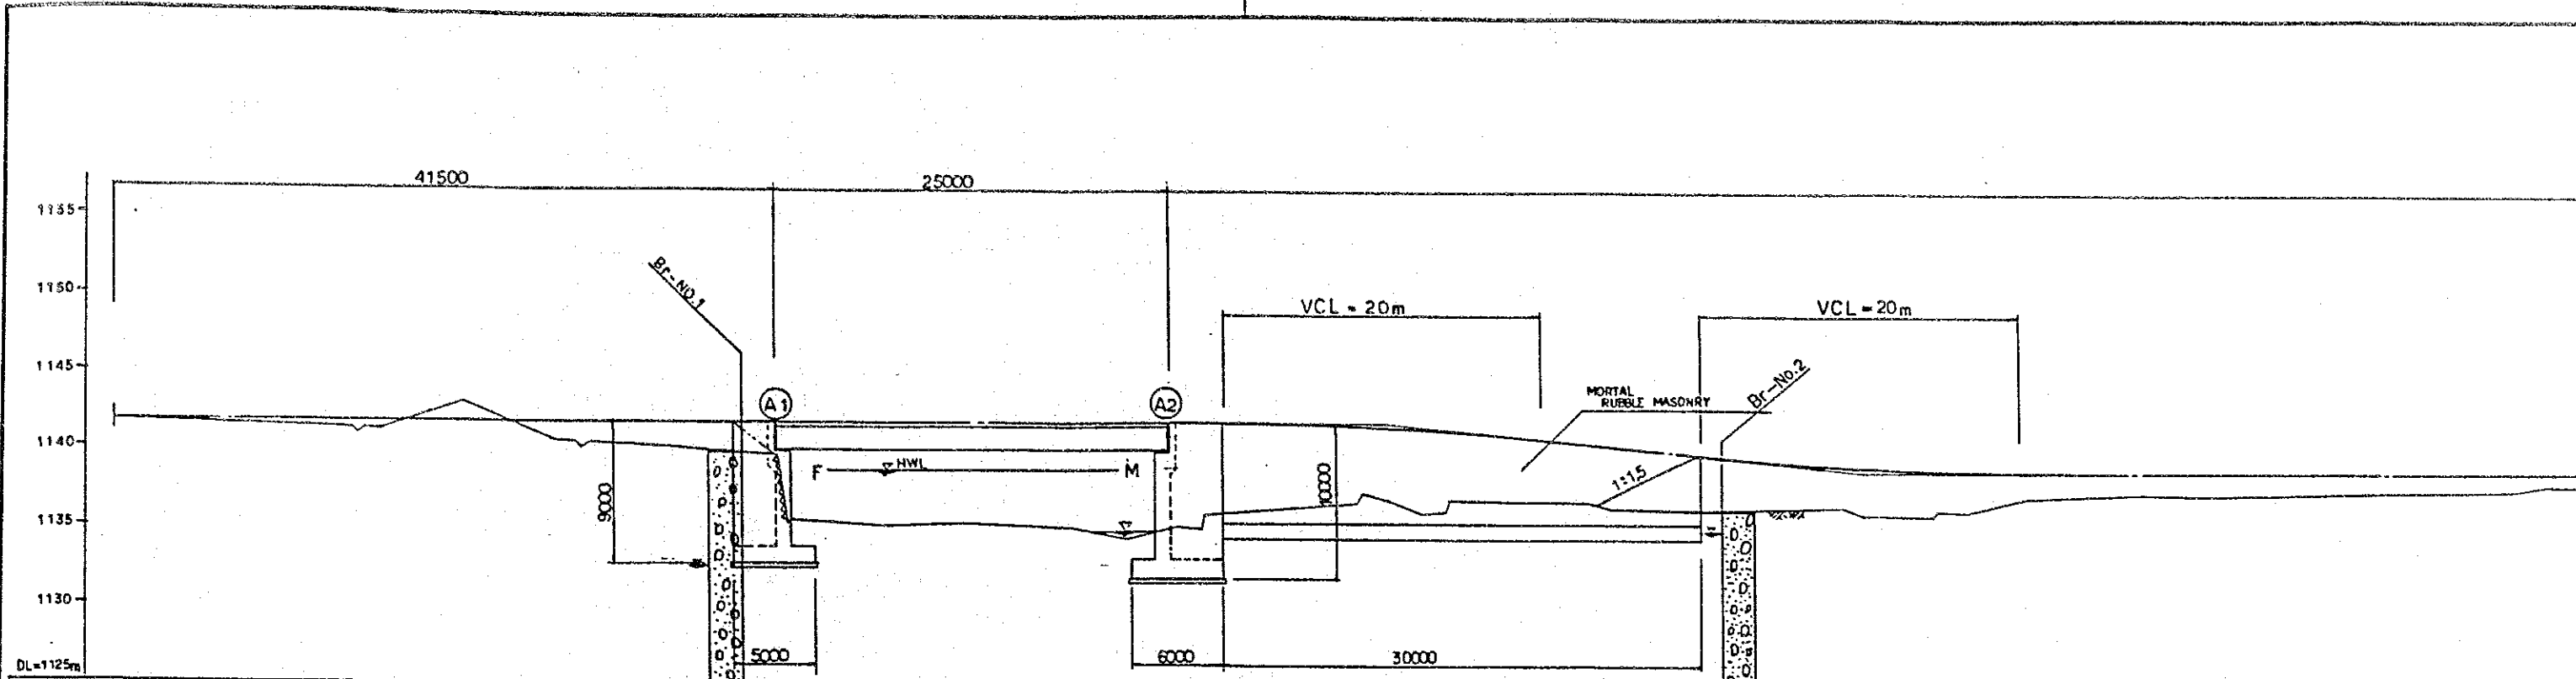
General Layout Plan of the No.12 Khai Bridge
